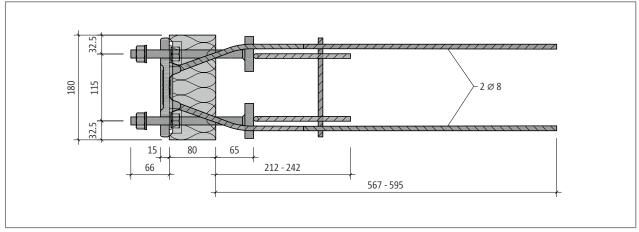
Schöck Isokorb® T type SQ-V1: Plan view
